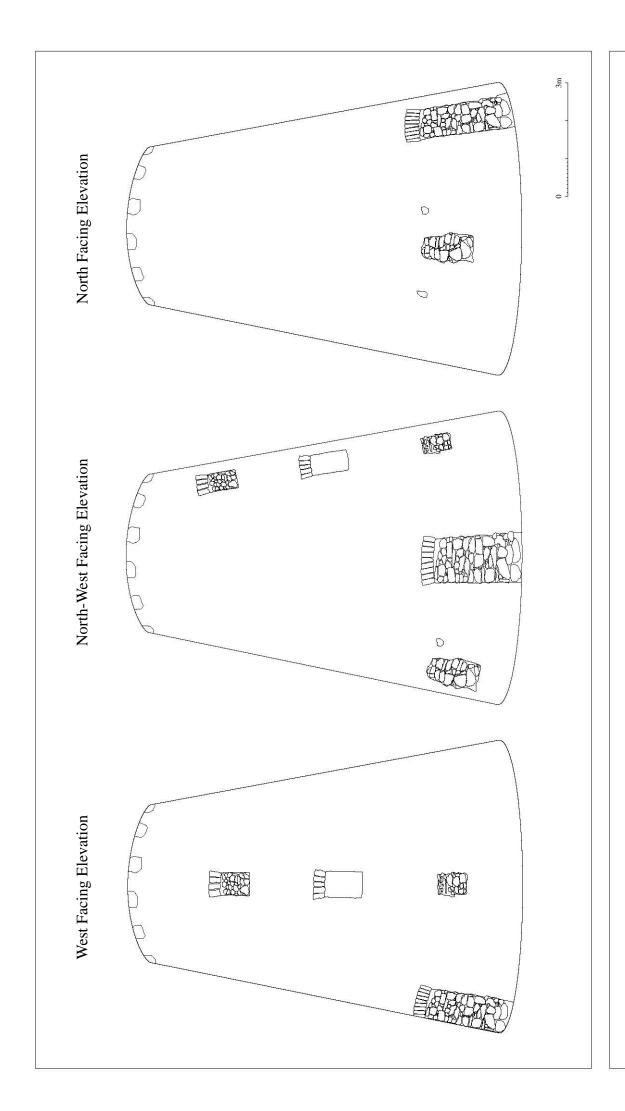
Windmill Tower Elevations West - North Facing. Scale 1:100. Drawn by C. Rees
